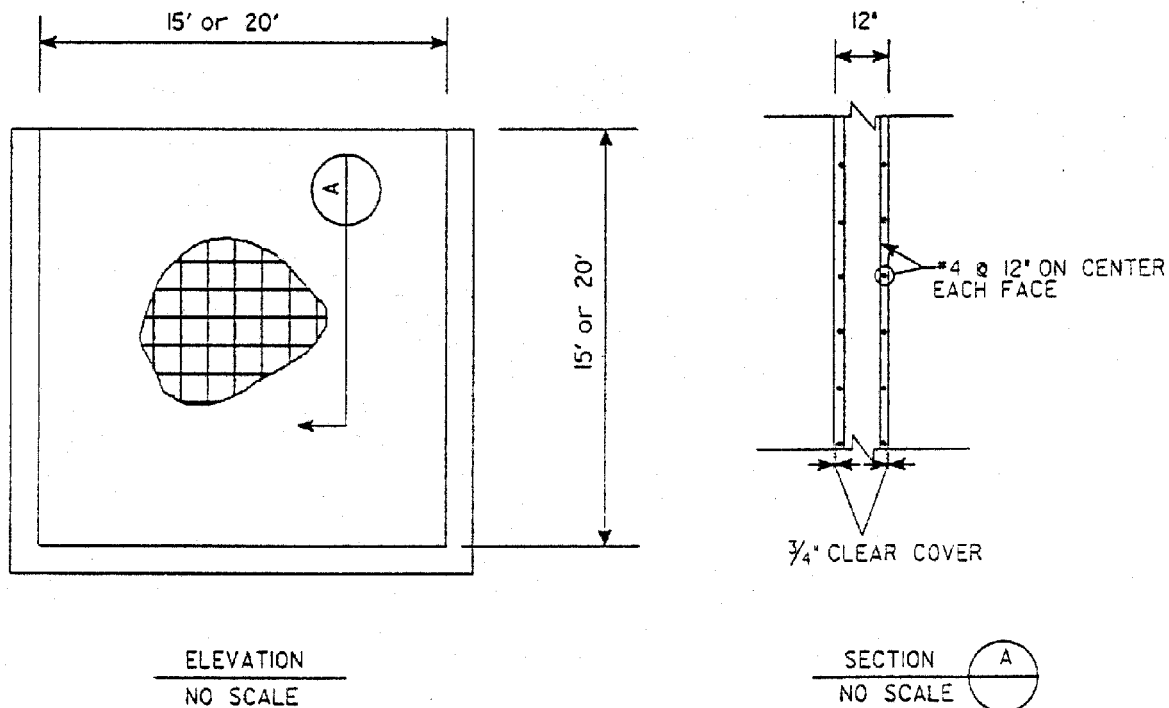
Typical 12" Reinforced Concrete Dividing Wall
